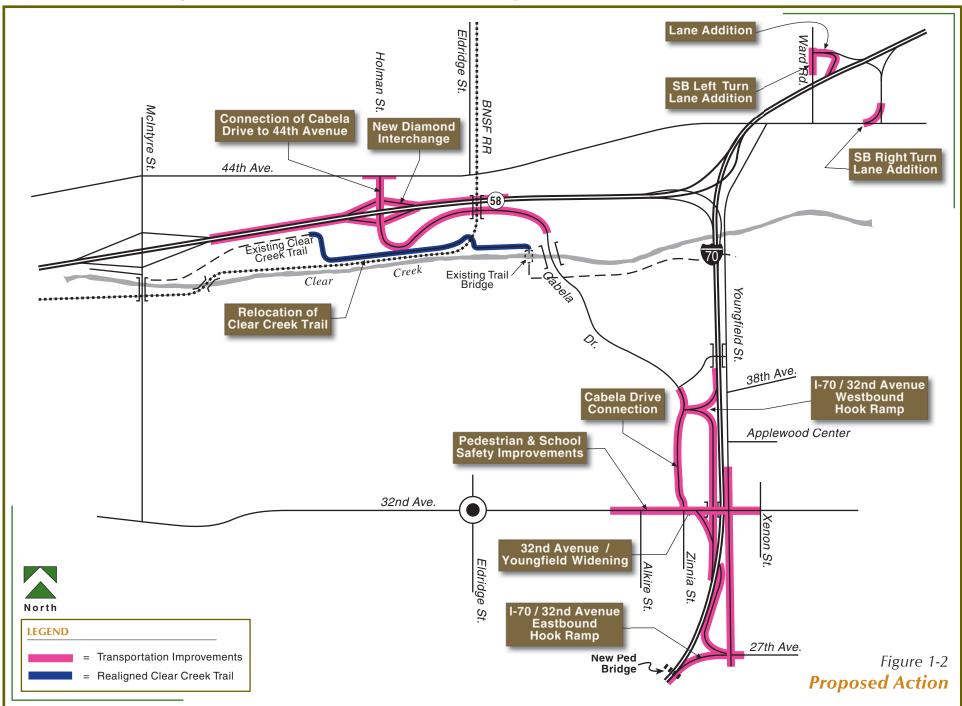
depicts the Proposed Action. Structural excavations for retaining walls and caissons related to the proposed ramps and bridges will be required.
